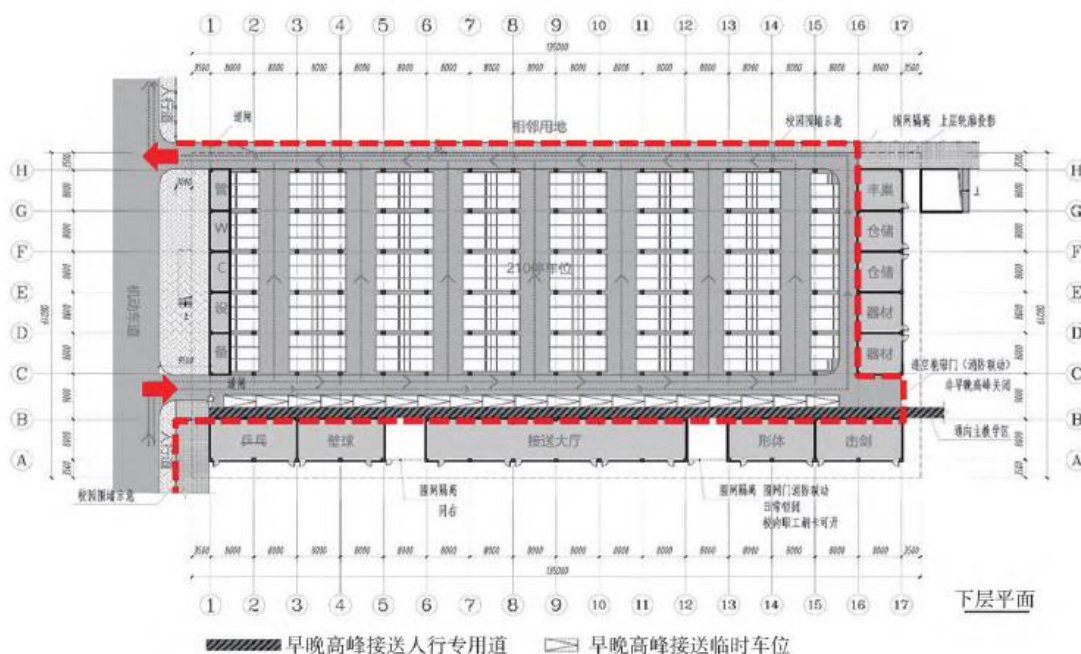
Student pick-up and drop-off system and long-term parking spaces in an underground garage of a selected school
